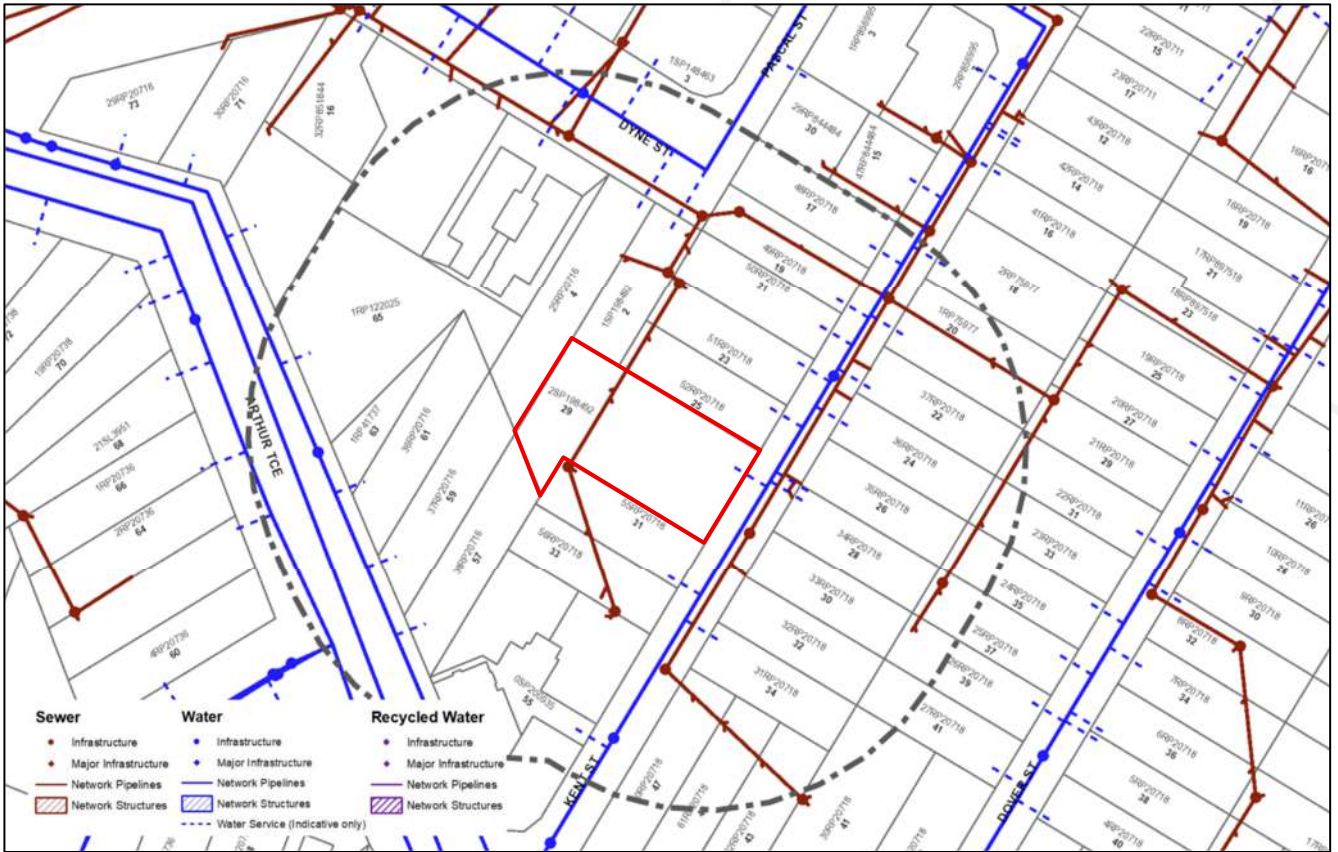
Existing servicing arrangements (Source: DBYD 2025)
